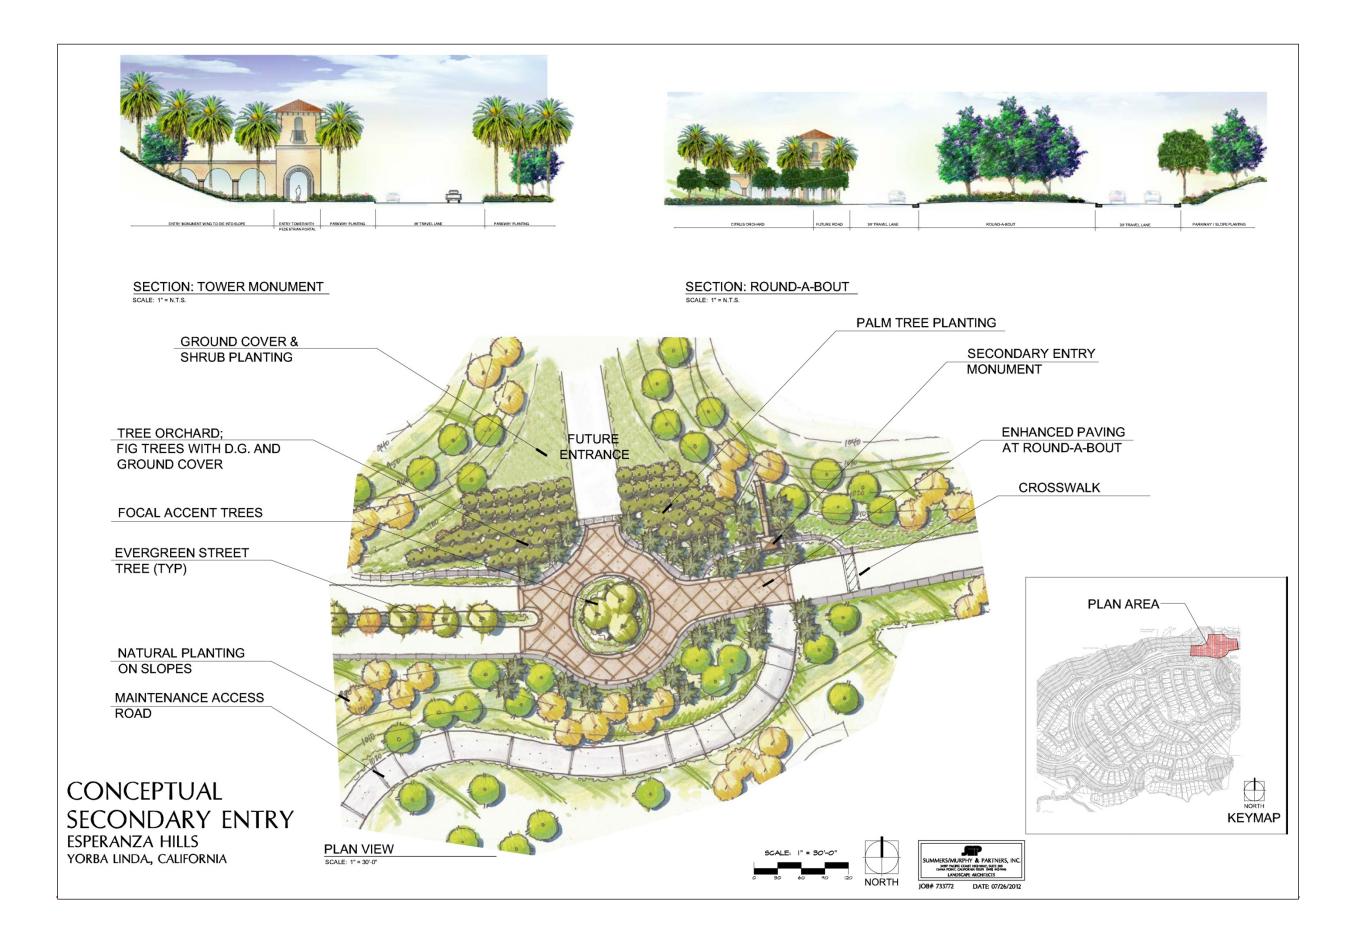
Conceptual Entry Plan, Aspen Way Drive Access Configuration
